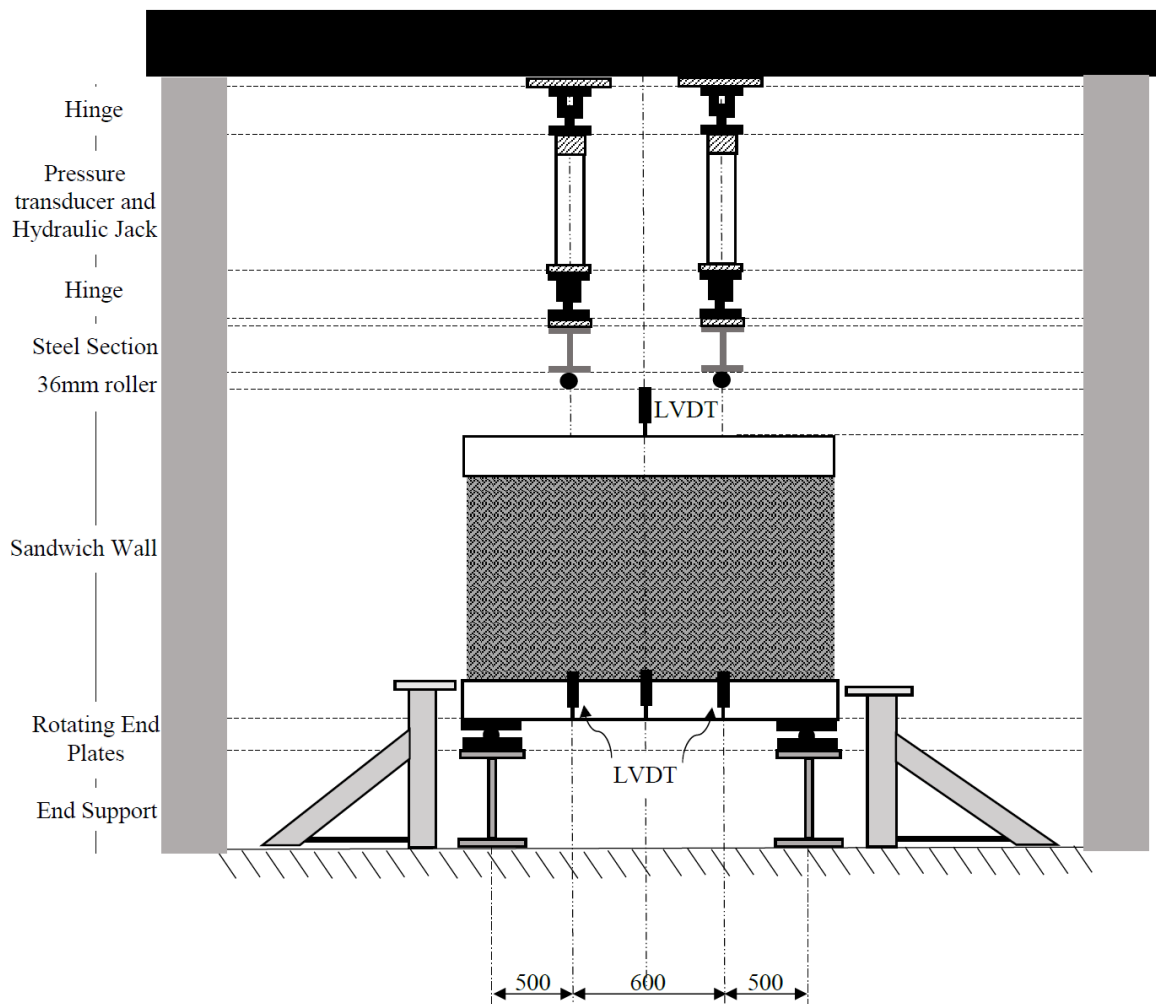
Test setup and Instrumentation - front elevation (all dimensions are in mm)
